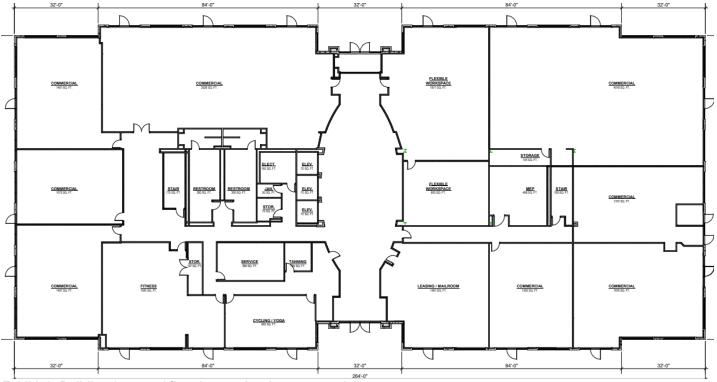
Building 1, ground floor layout showing commercial spaces.
